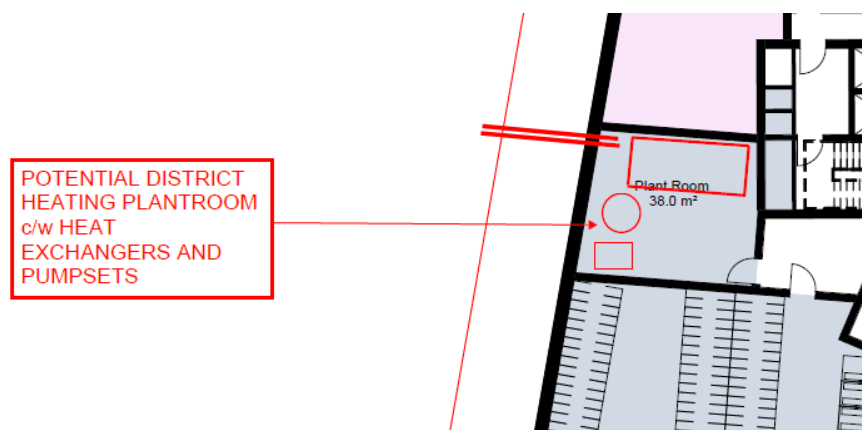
Allowance for District Heating on the Plant Room of Uxbridge CoLiving and Hotel
